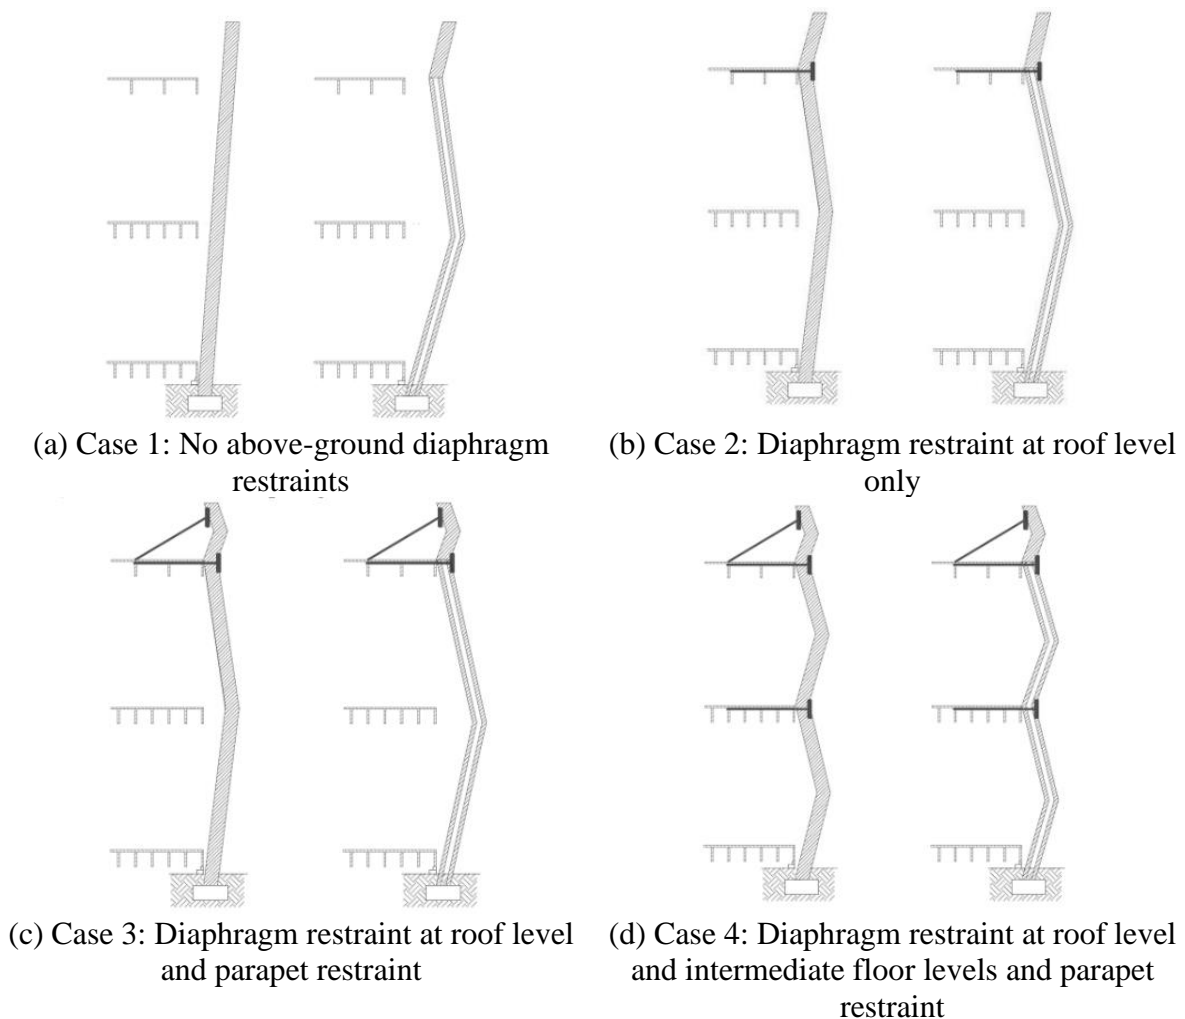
URM wall out-of-plane collapse mechanisms for different lateral restraint conditions (solid walls are shown on the left and cavity walls on the right of the figures) from Walsh [53]. Note that the cavity walls were considered simply supported due to the roof framing and solid parapets on the outer leaves; Therefore, both Case 1 and Case 2 were treated identically.
